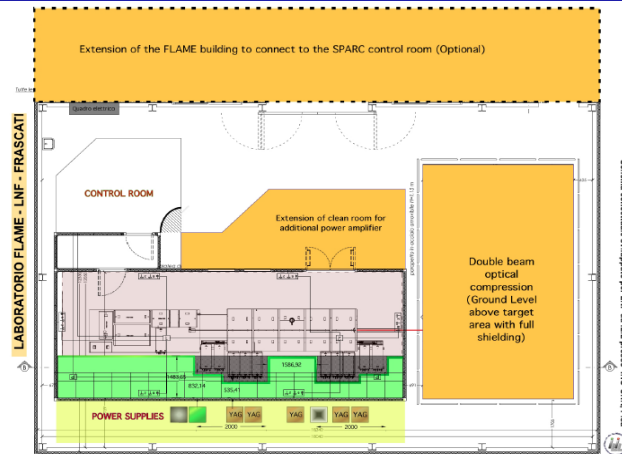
Layout of the upgraded FLAME building, with the ground floor layout including the extension of the clean room and the dual compressor room. An optional extension of the FLAME building is also planned to allow a better connection with the present Sparc control room building.
